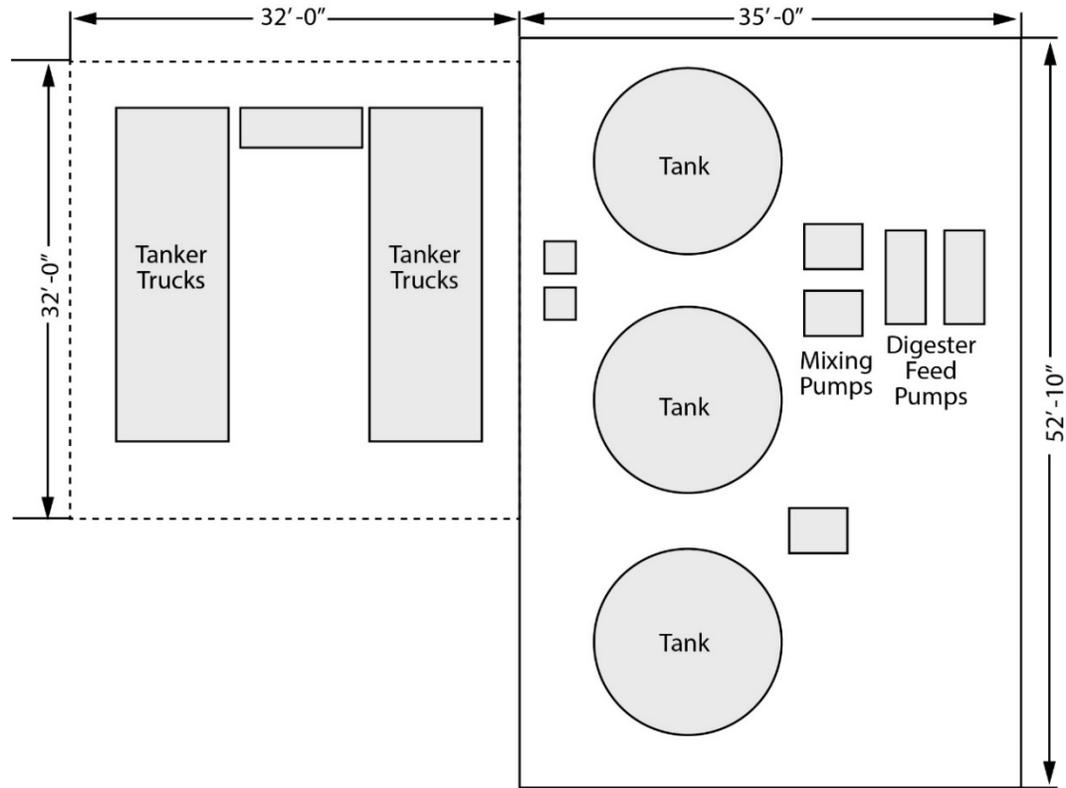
Food Waste Receiving Facility Conceptual Site Layout and Rendering
